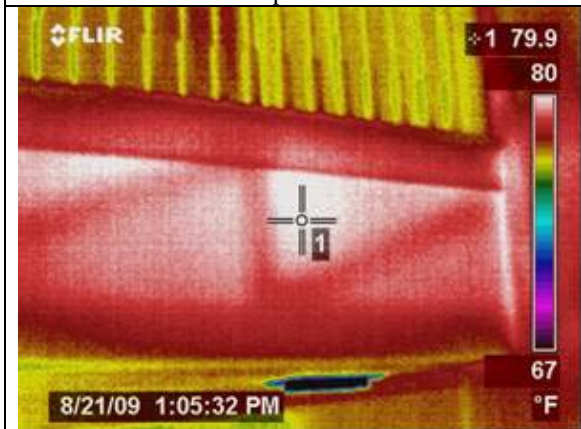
Warm floor space area next to west attic located just to the right of image. The dark area near the time label is a cold supply grill on the first floor ceiling. (Image credit Withers)
